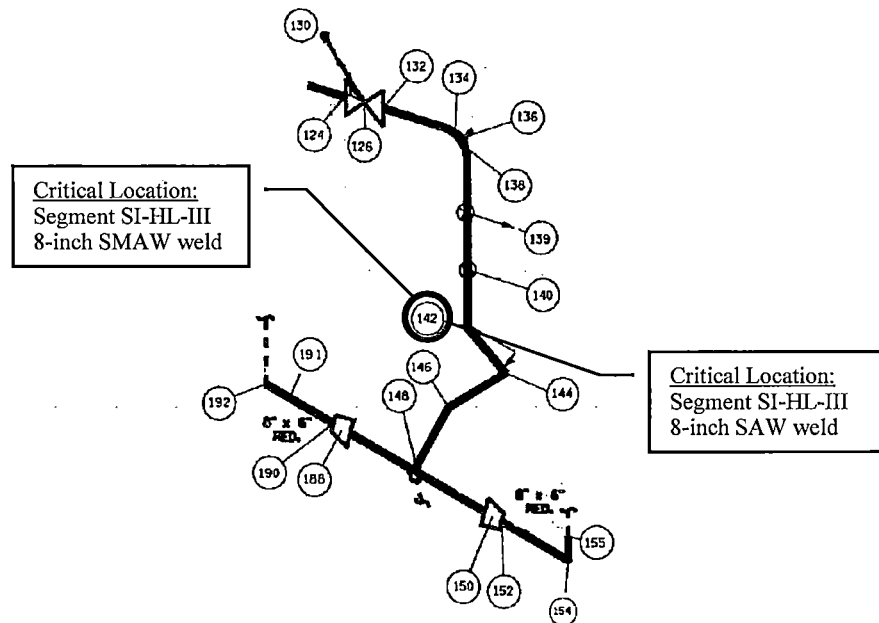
D.C. Cook Unit 1 Hot Leg SI Line Loops 1 and 4 Critical Weld Locations
